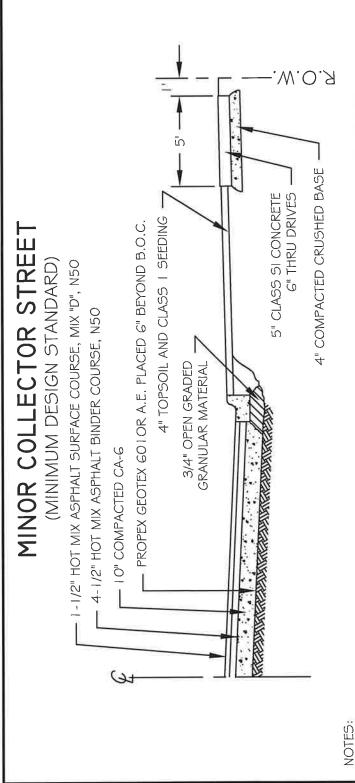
EXHIBIT "M" TYPICAL COLLECTOR STREET CROSS SECTION
